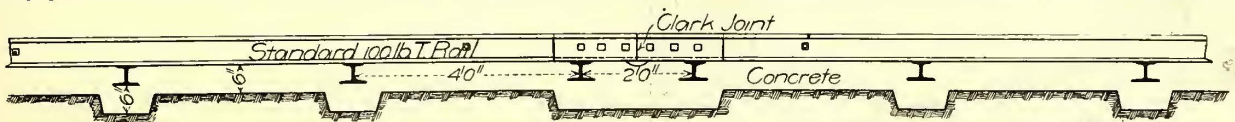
T-Rail Construction with Steel Ties in Syracuse
